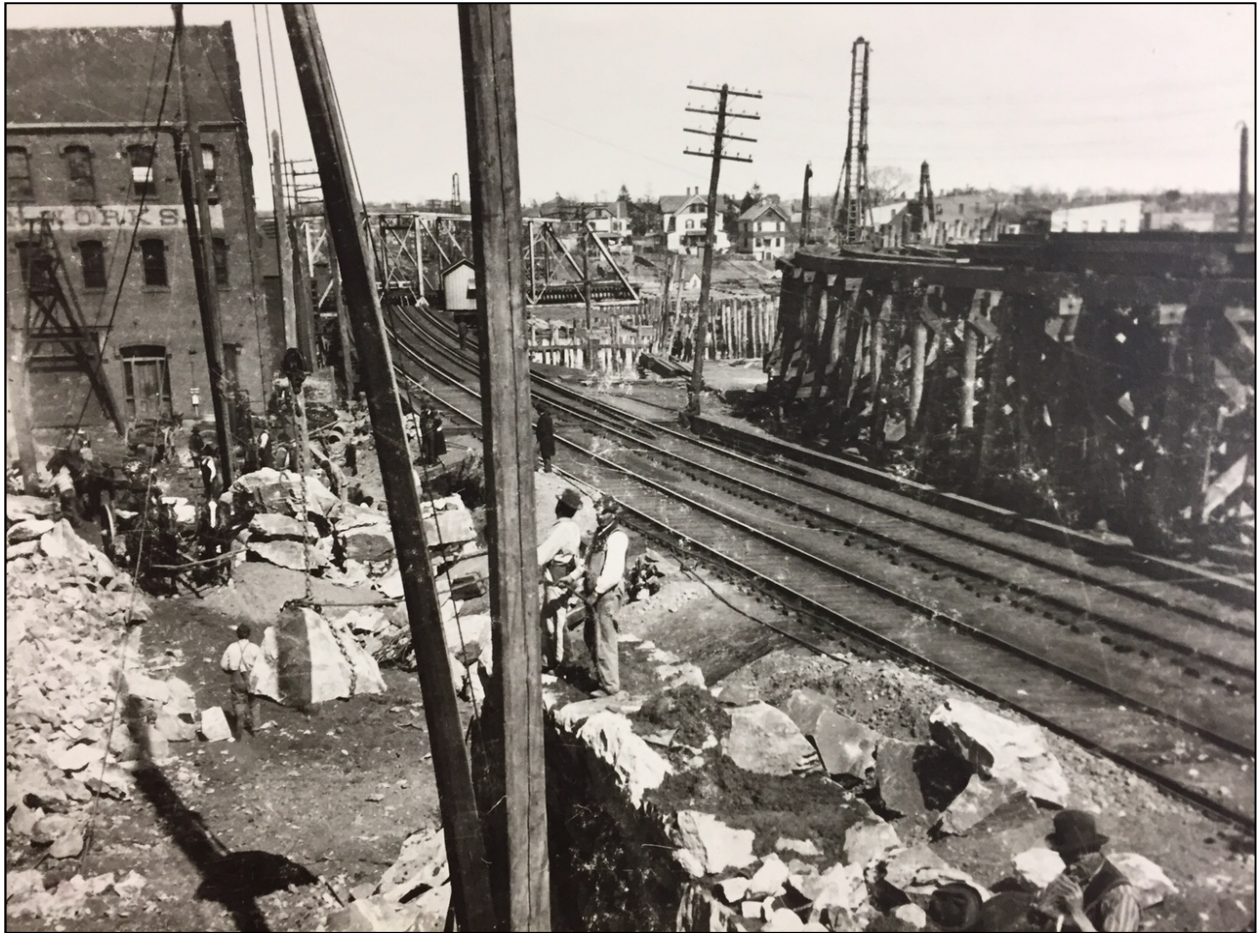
Construction of the retaining wall on the north side of the railroad right-of-way west of Water Street, ca. 1895 (Norwalk History Room, Norwalk Public Library). Trestle at right is for depositing fill for the embankment).
